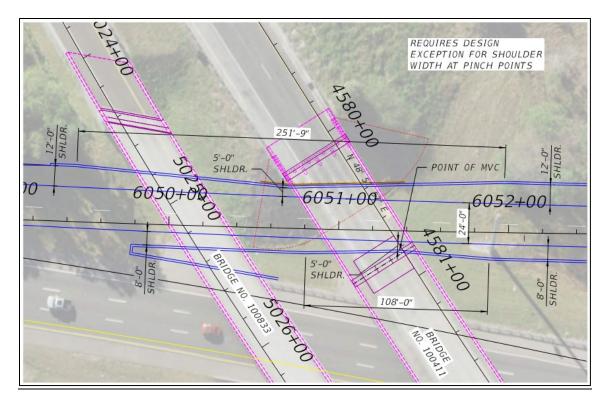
2-Lane On-Ramp Under Bridge-No. 100411 - Plan View
